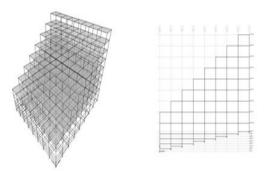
3-D View and Elevation of a Set & Step back building for storey (10°Slope)
